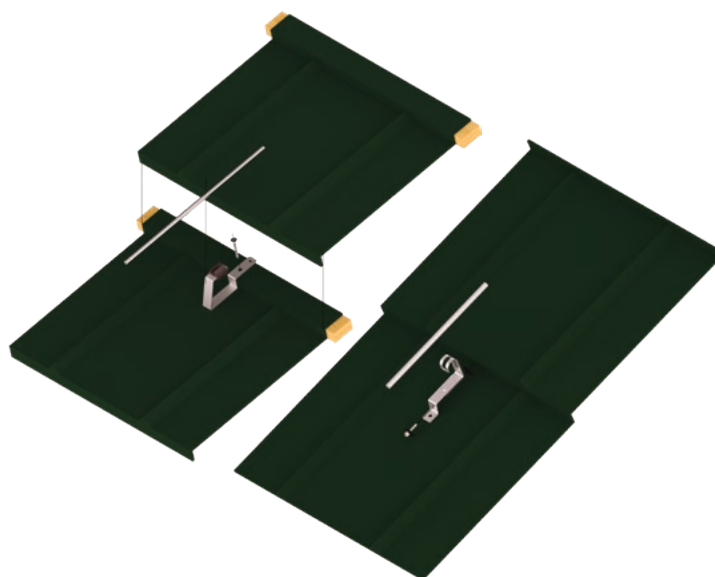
Installation of suitable load-bearing elements on tin sheet roofing types DECRA, GERARD, etc.
